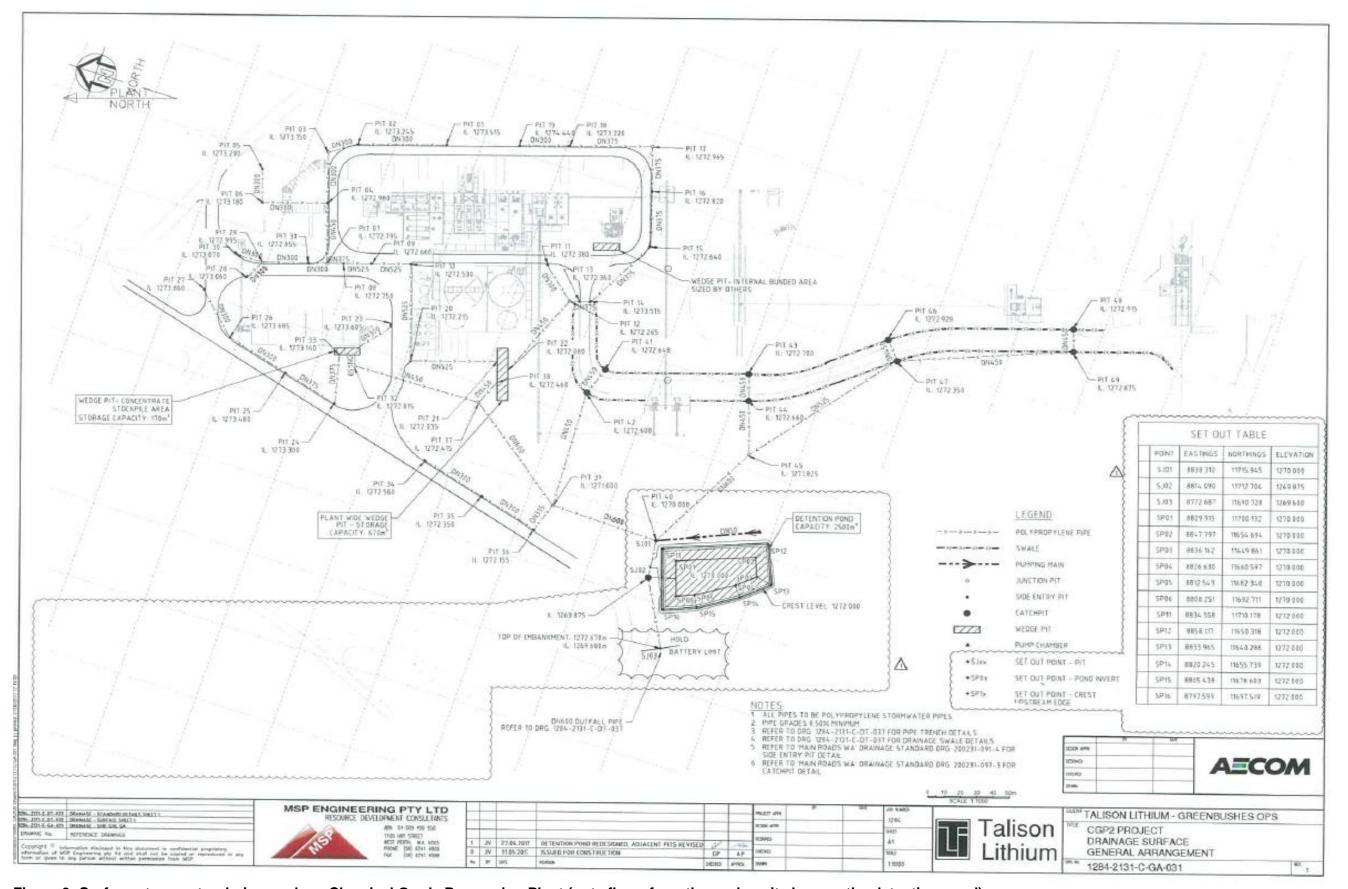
Surface stormwater drainage plan - Chemical Grade Processing Plant (note flows from the wedge pits bypass the detention pond).
